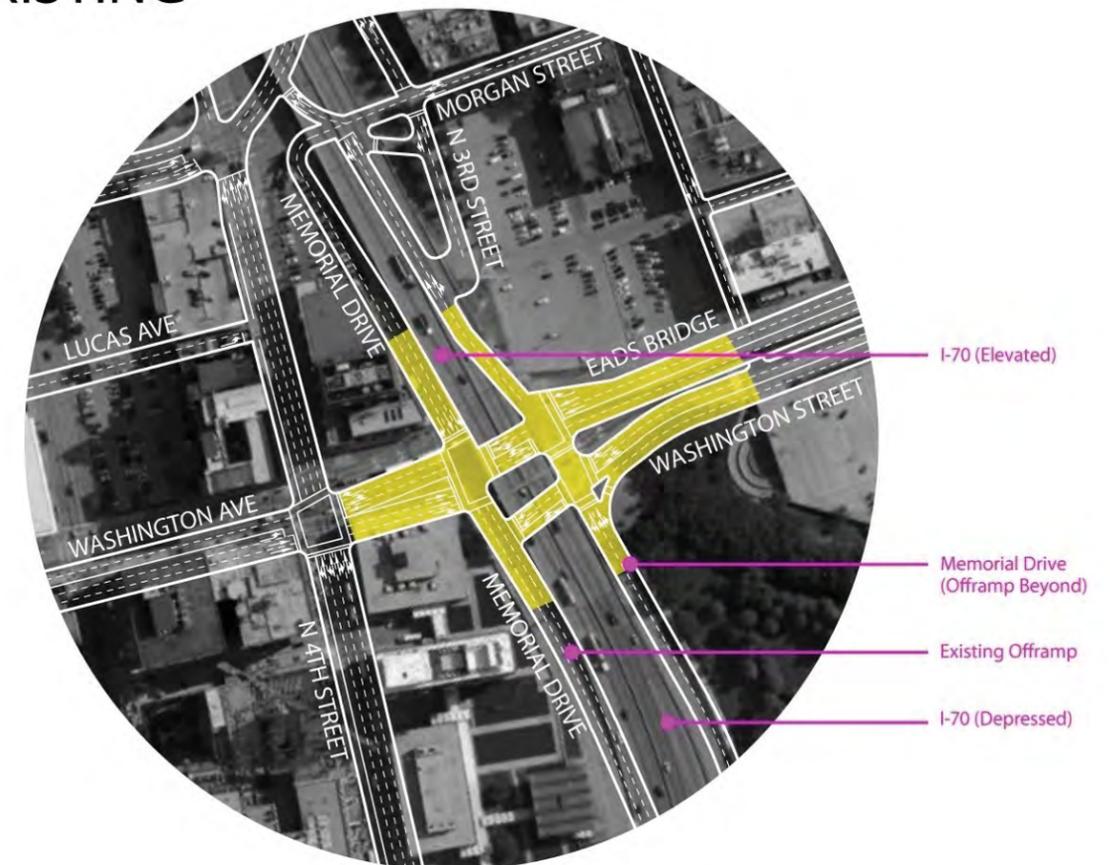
Existing Washington Avenue and I-70 Ramp Configuration
